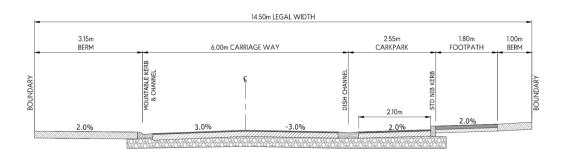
Typical Cross-Section (G) Local Road - 14.5m With Carpark
